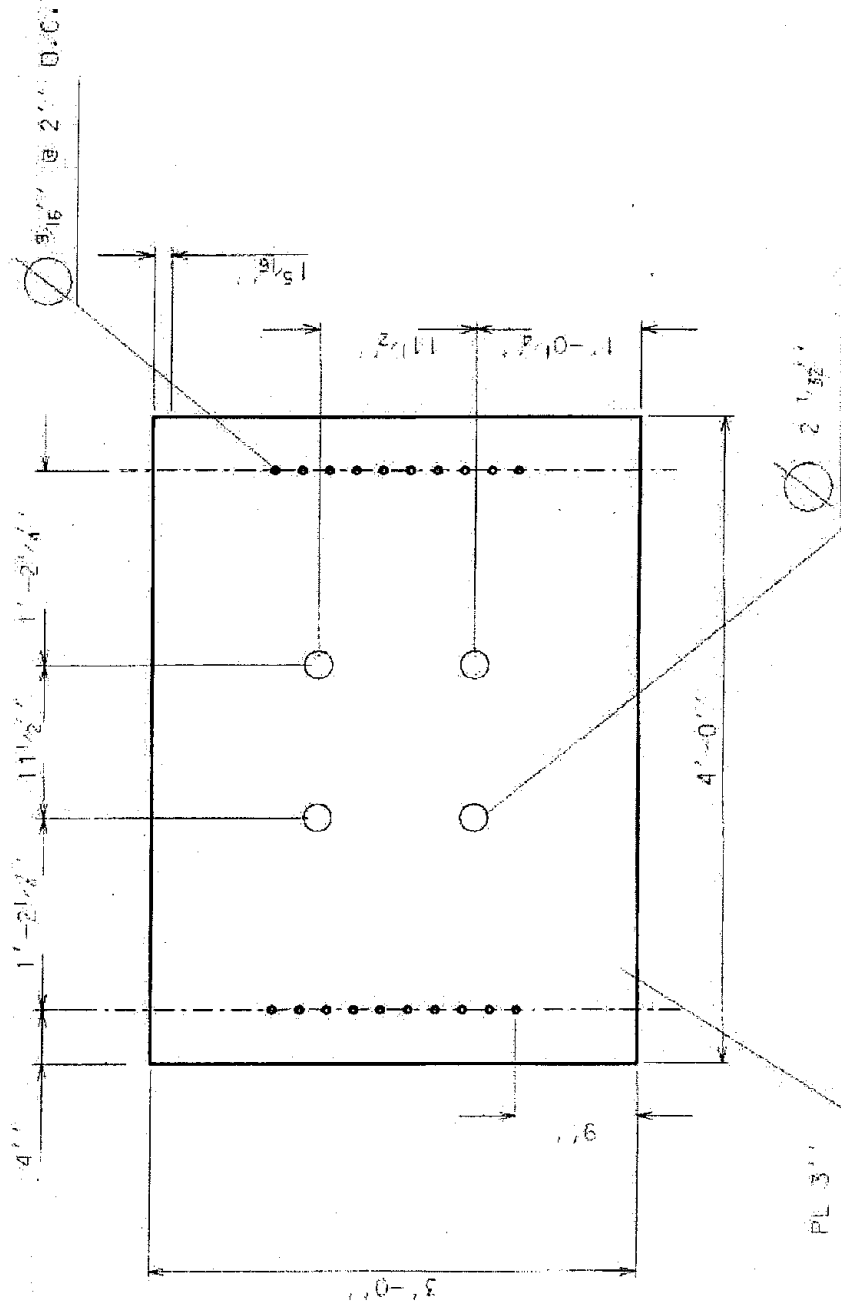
Construction drawing of beam cap mounting bracket detail showing holes for the prestressing tendons (1'=305 mm, 1''=25.4 mm)
